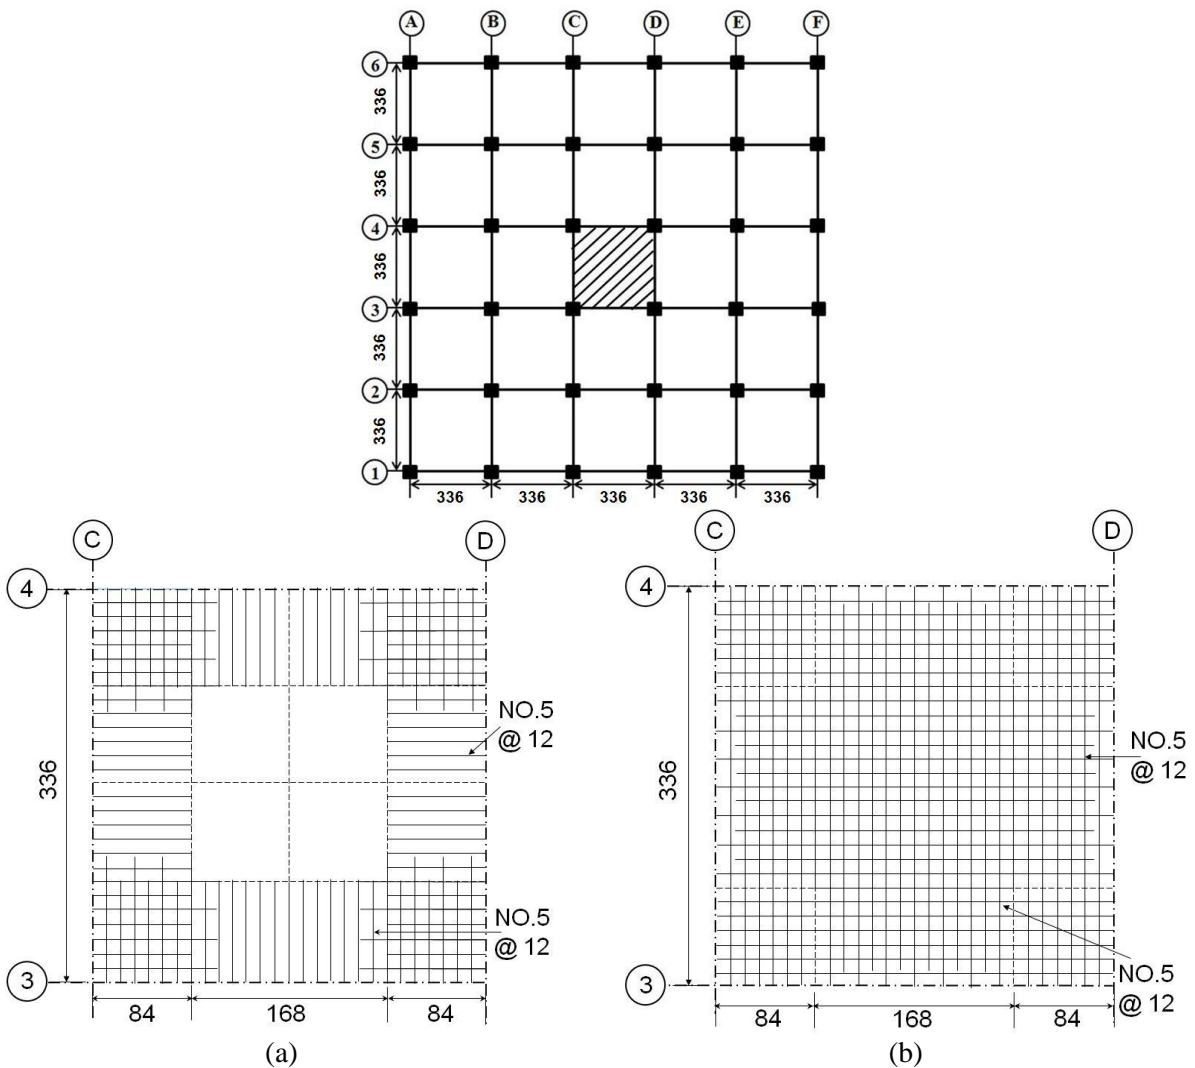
Reinforcement distribution of slab: (a) top reinforcement and (b) bottom reinforcement. (unit of dimension: in.).
